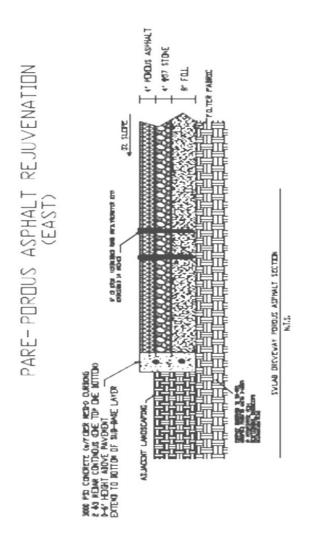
Cross-sectional view of Pervious Asphalt Rejuvenation (PAR)
